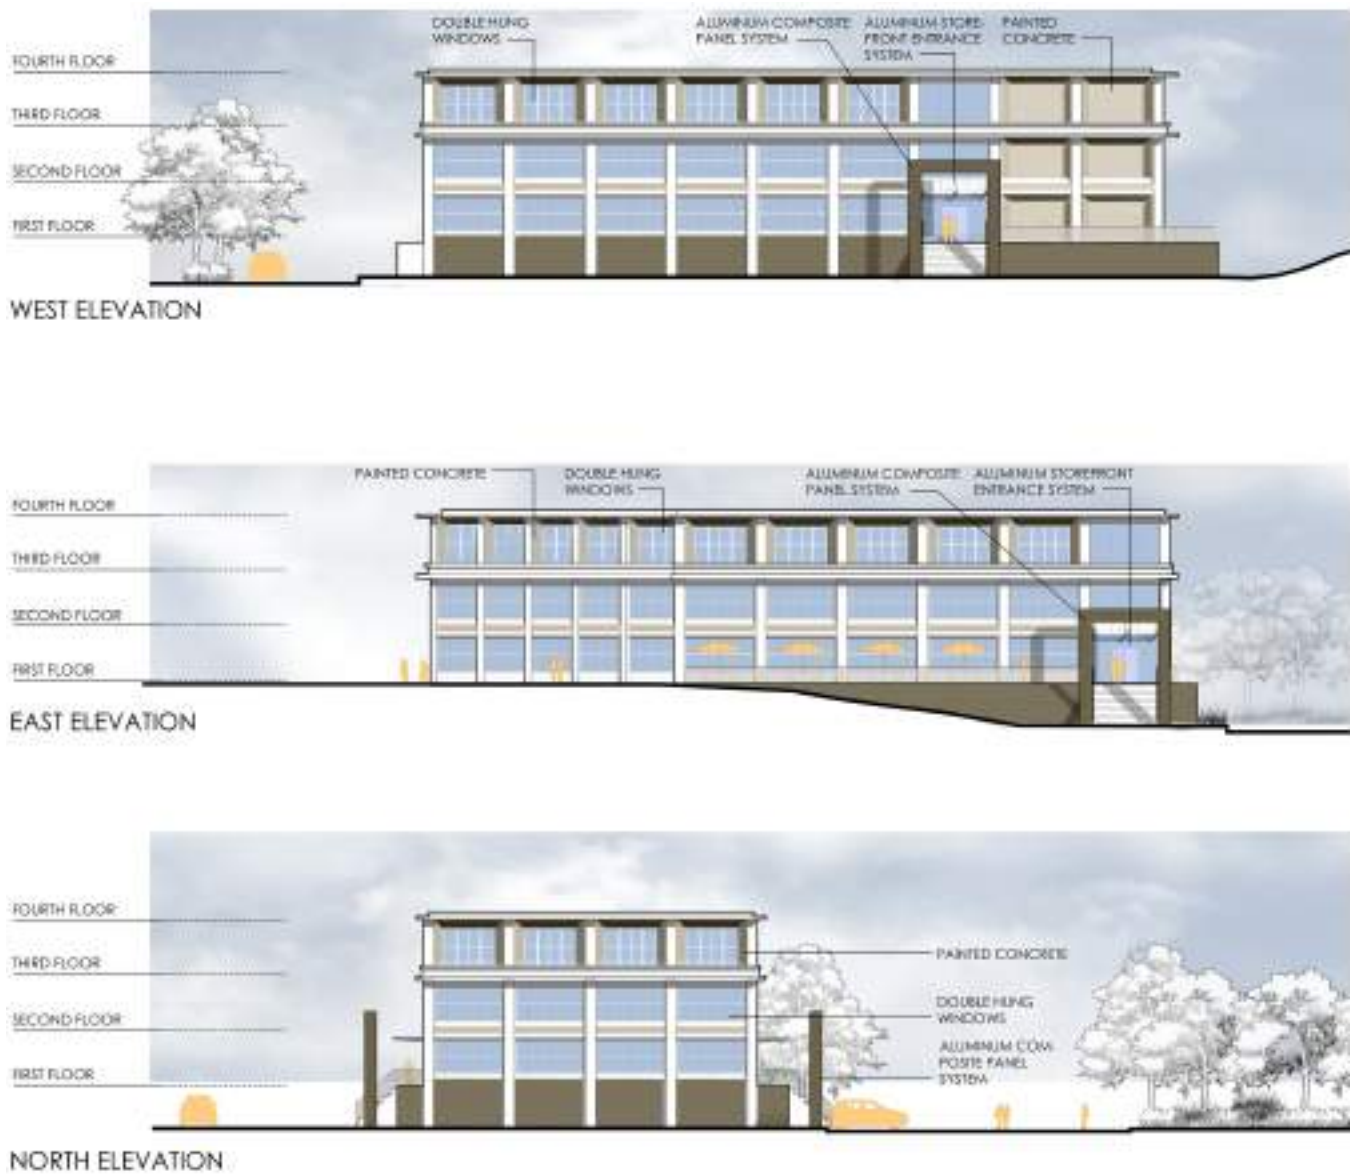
Building 21 Proposed Elevations (CJS)
